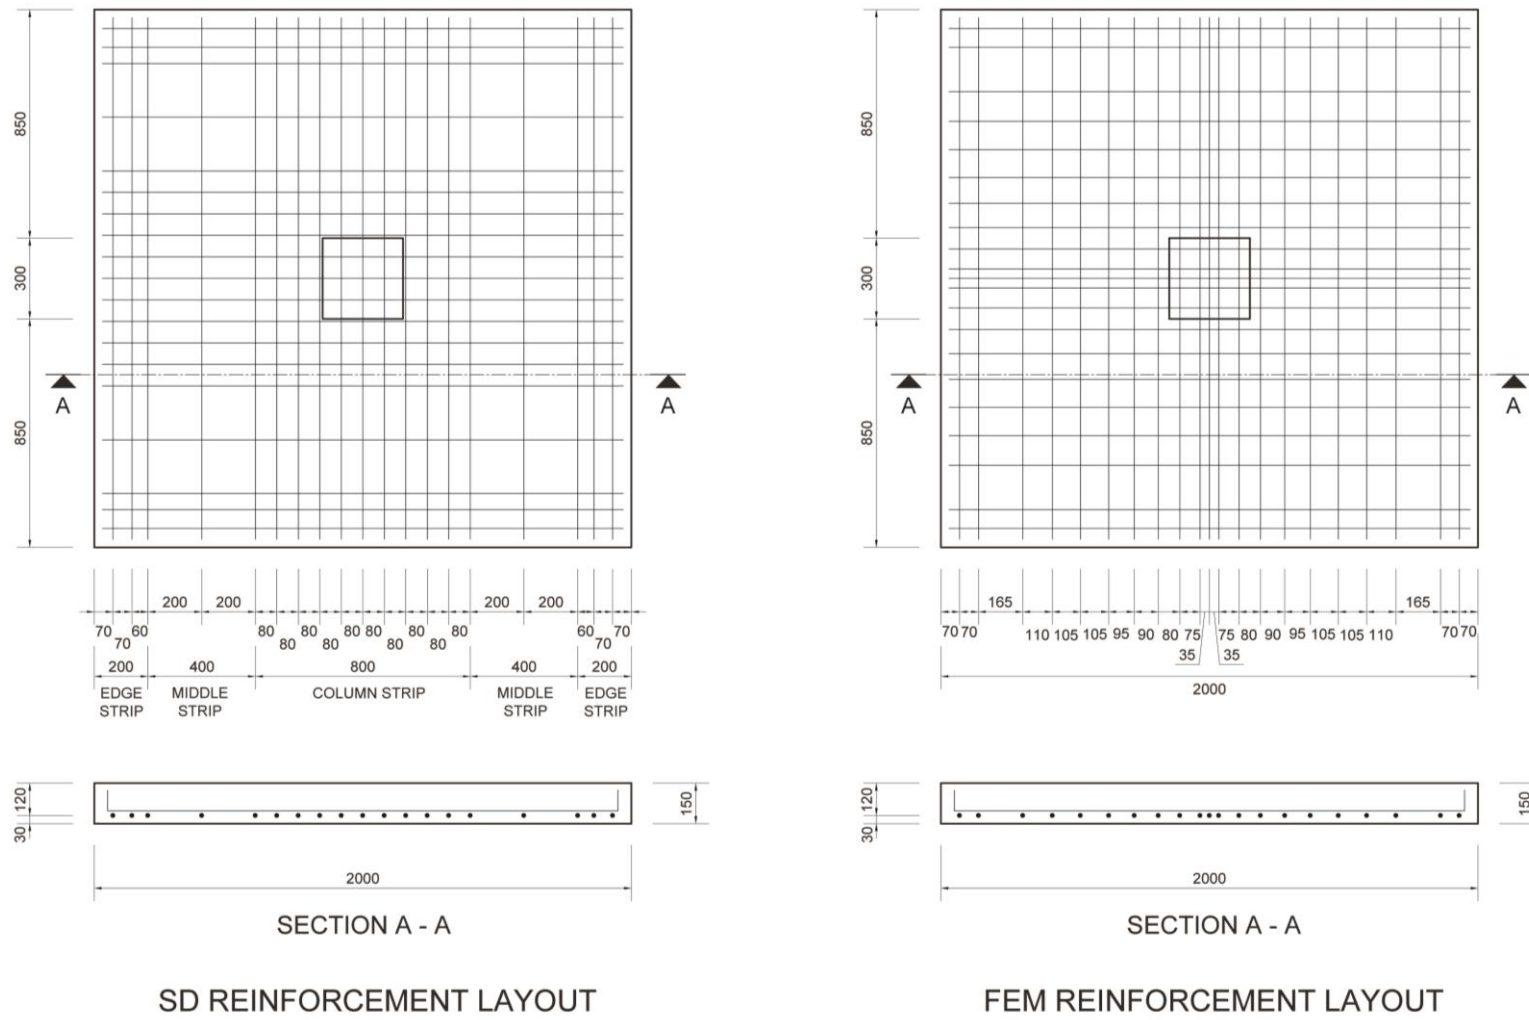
Reinforcement spacing for (a) SM and (b) FE flat slab samples
